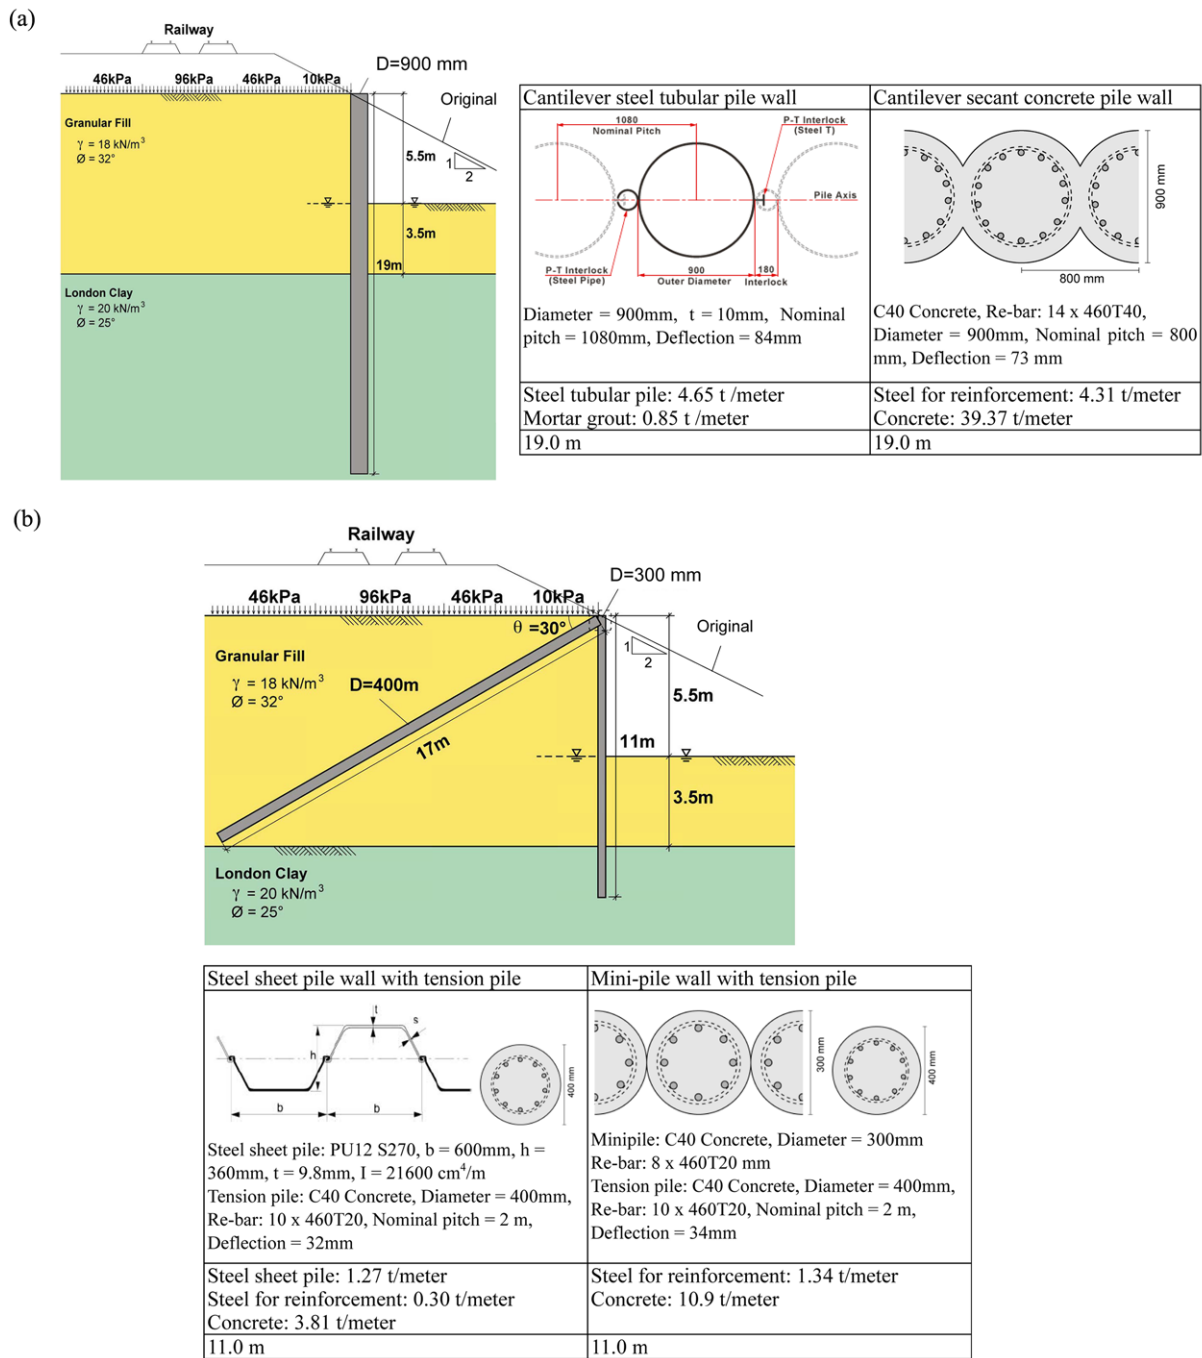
Retaining Wall Designs for a Road Widening Project (After Inui *et al.*, 2011): (a) Cross-section of Cantilever Wall Systems, (b) Cross-Section of Propped Wall Systems
